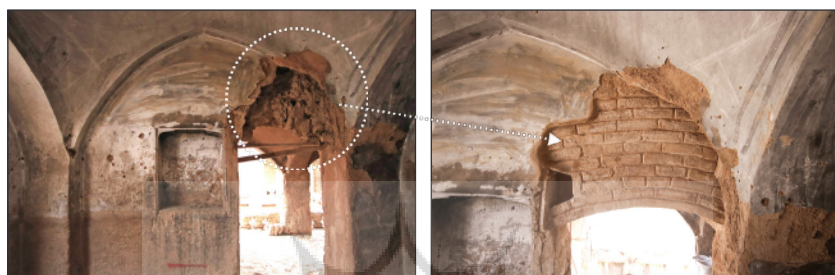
Stitching and patching the crack in the northern wall of space 23 after fixing the causes of the damage.
